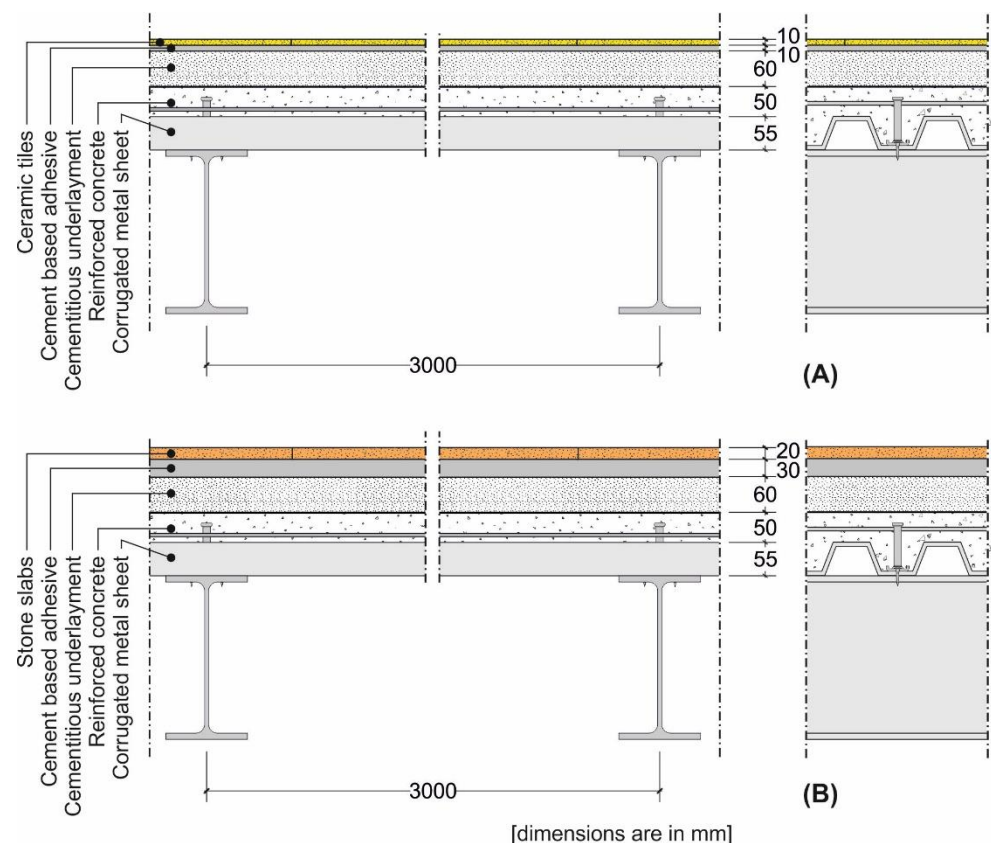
Cross-section of the composite steel–concrete slab with (A) ceramic and (B) stone floorings.
